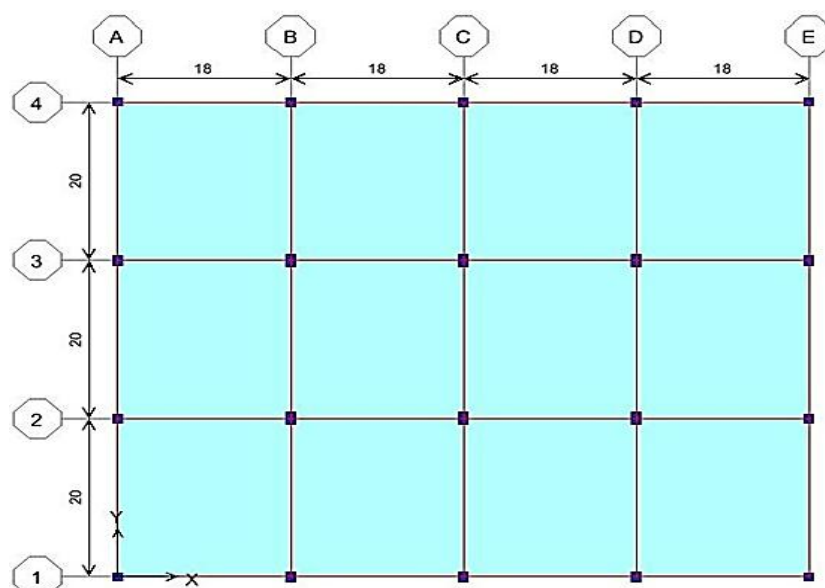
Typical plan view exhibiting the location and orientation of columns.
